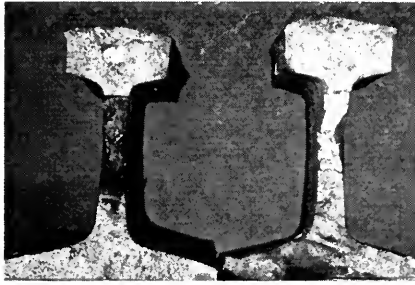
(Investigation 135-28)—Photograph showing the fractured faces at location A in Fig. 13.
